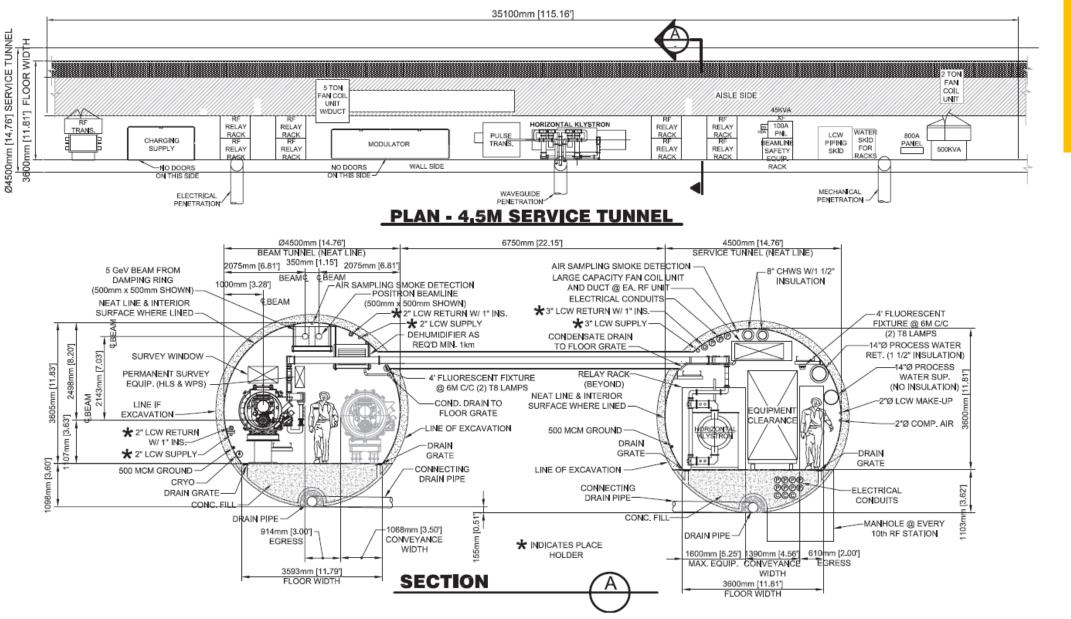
Plan view of service tunnel components in Main Linac (upper). Cross section of two Main Linac tunnels (lower).
